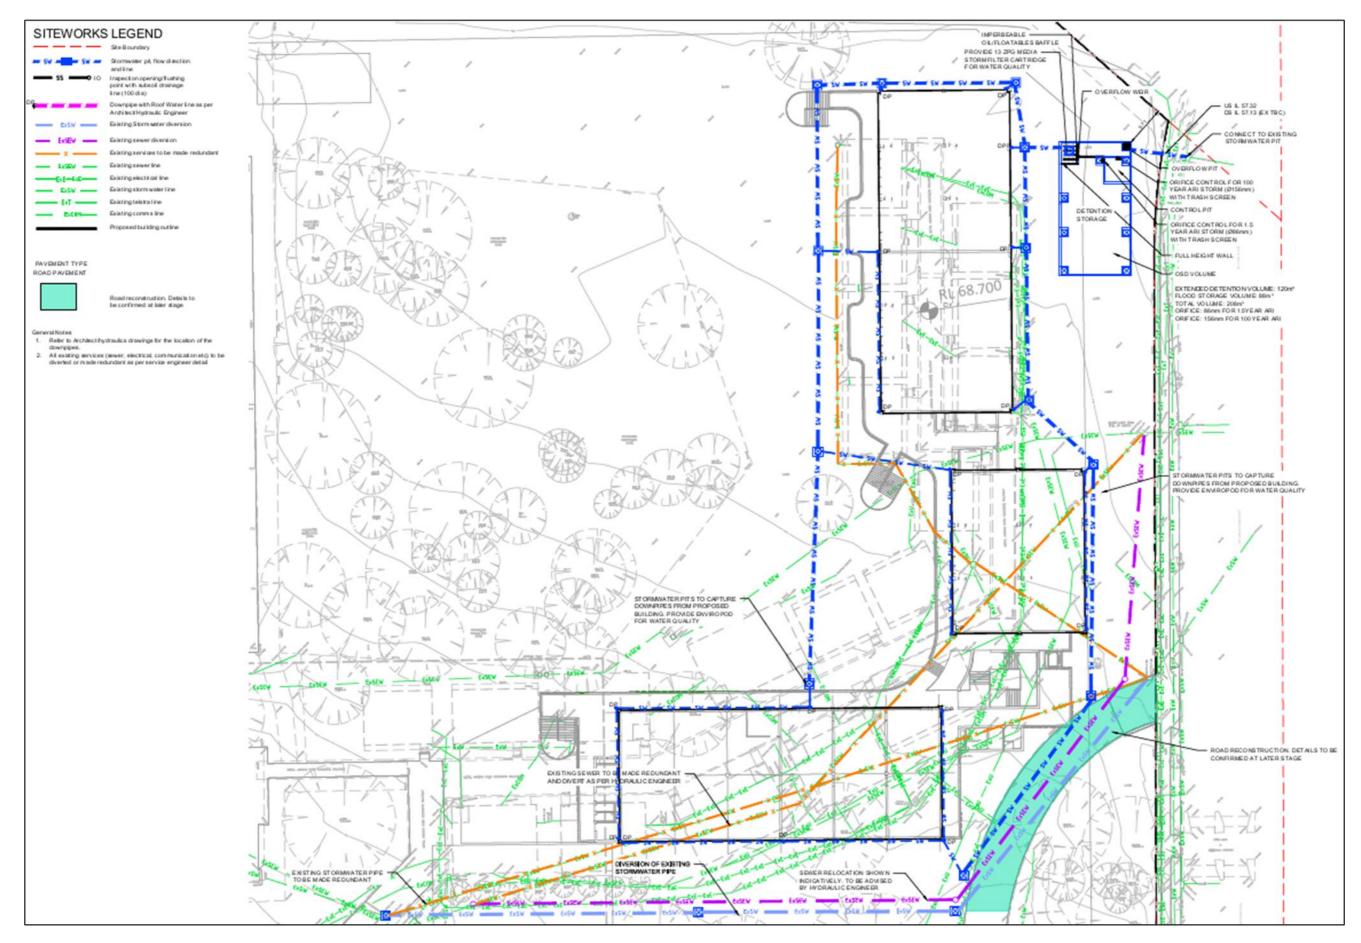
SSD/EIS – Proposed stormwater infrastructure and detention storage outlined in dark blue (Enstruct 2021)
